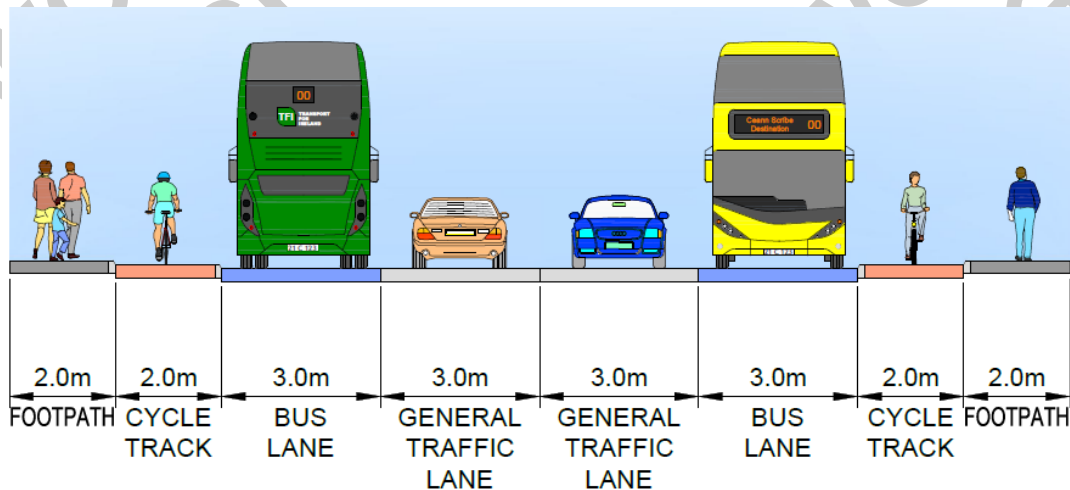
Section 1, Proposed Option 1 – Cross Section B-B
